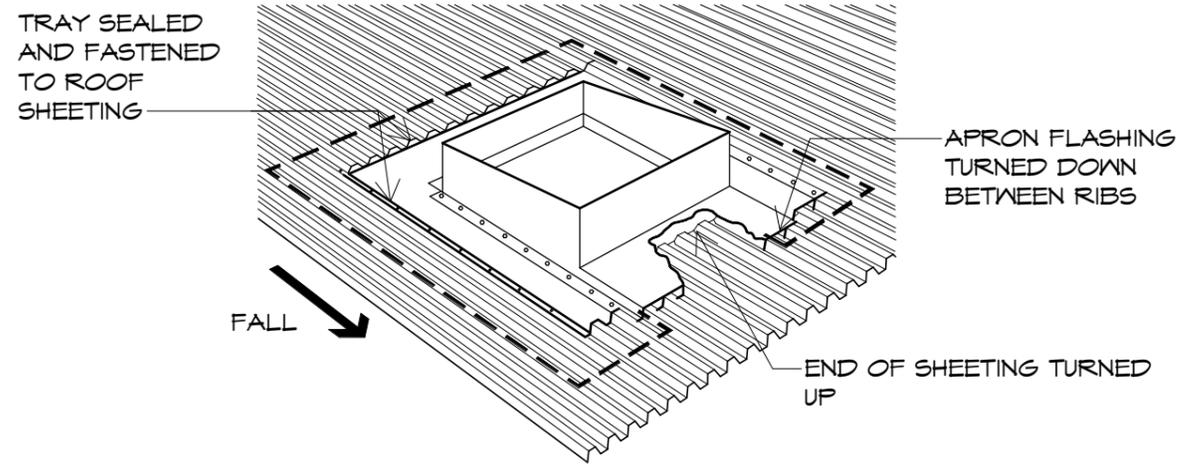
F: LARGE PENETRATIONS USING APRON-TYPICAL ROOF PENETRATION FLASHING DETAILS
